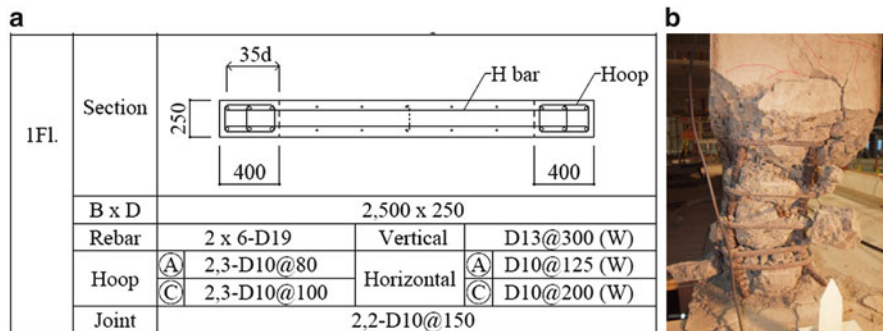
(a) RC conventional wall (Nagae et al. 2011). (b) Wall damage
